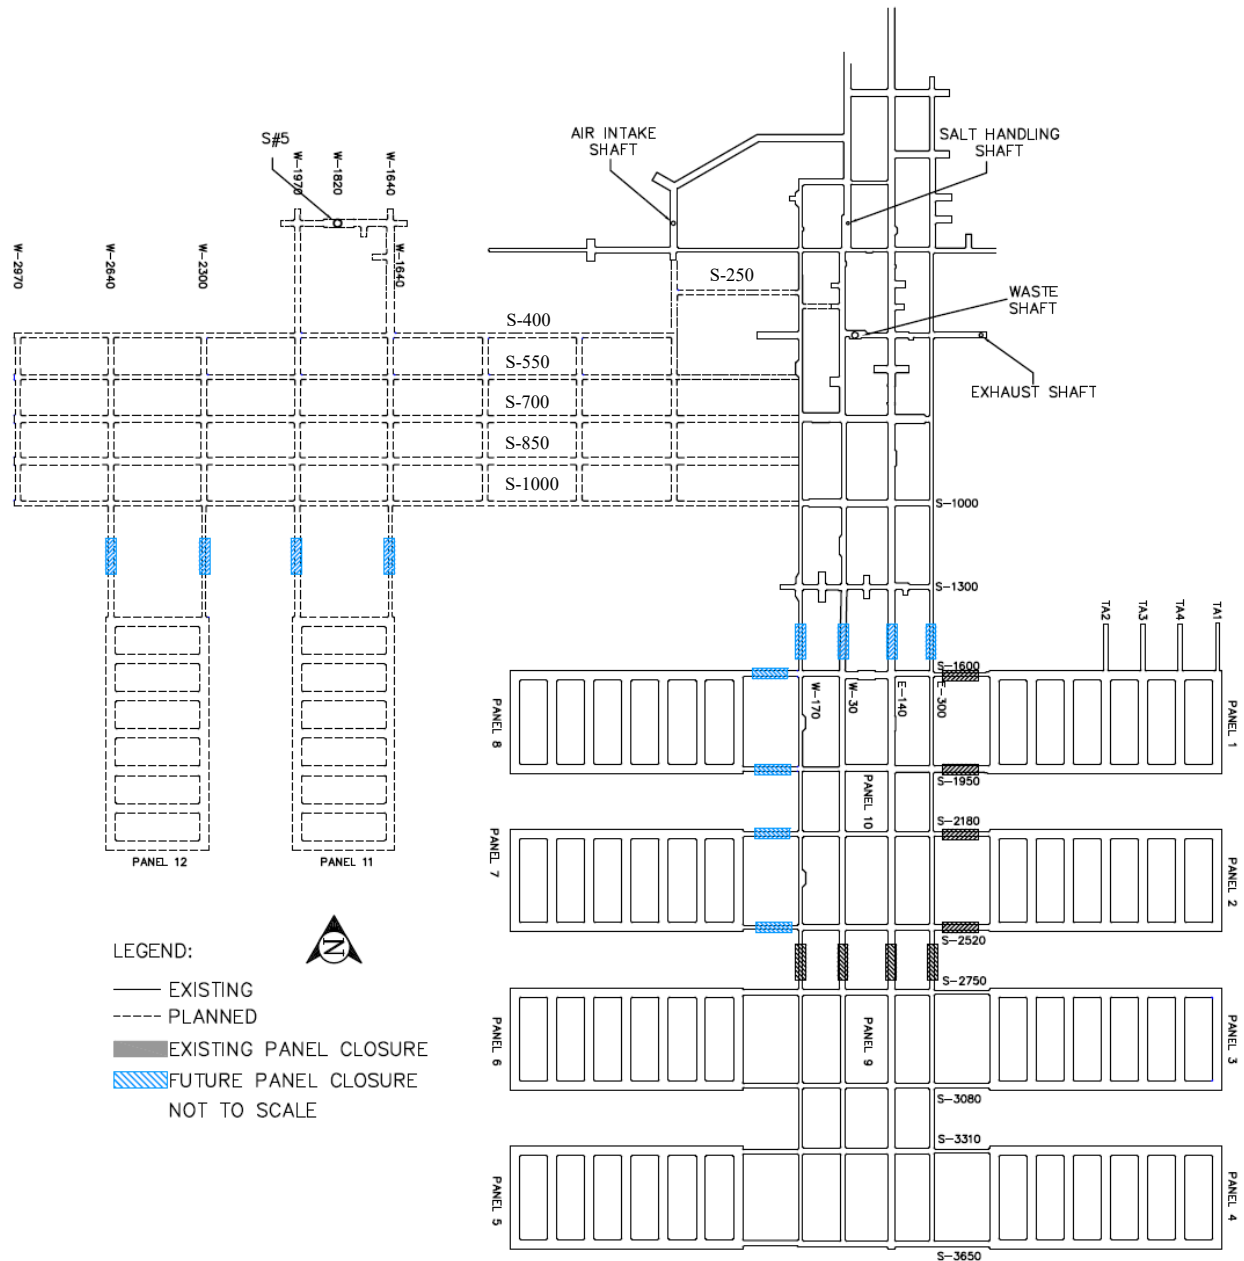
Proposed Location Panels 11 and 12 at the WIPP Facility
